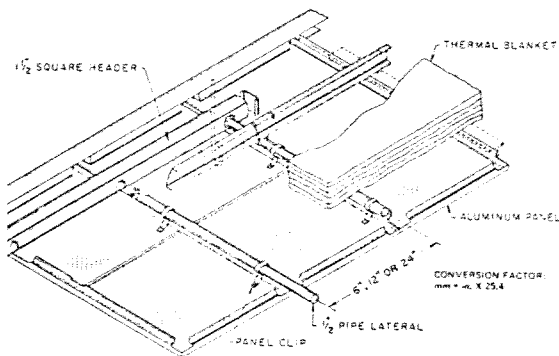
Extruded Aluminum Panels with Integral Copper Tube
